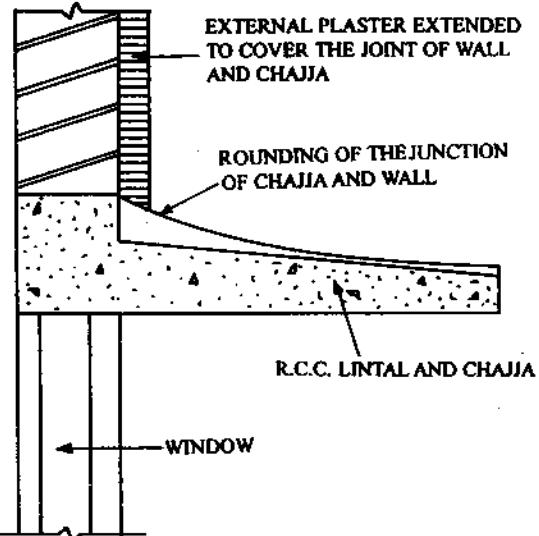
Damp Proofing at Junction of wall and Chajja
